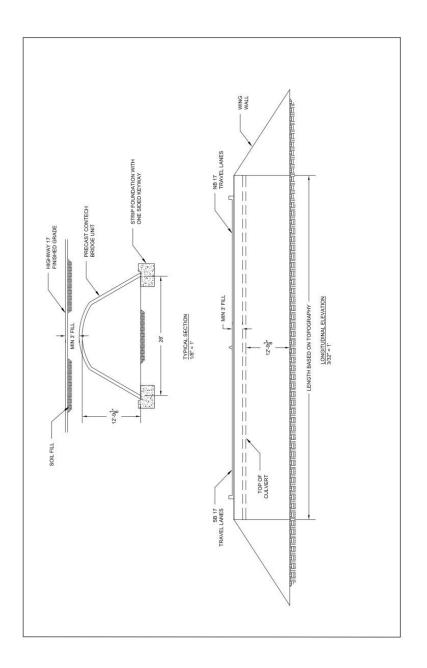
Longitudinal elevation and cross section views of the proposed precast concrete culvert from Contech Engineered Solutions.
